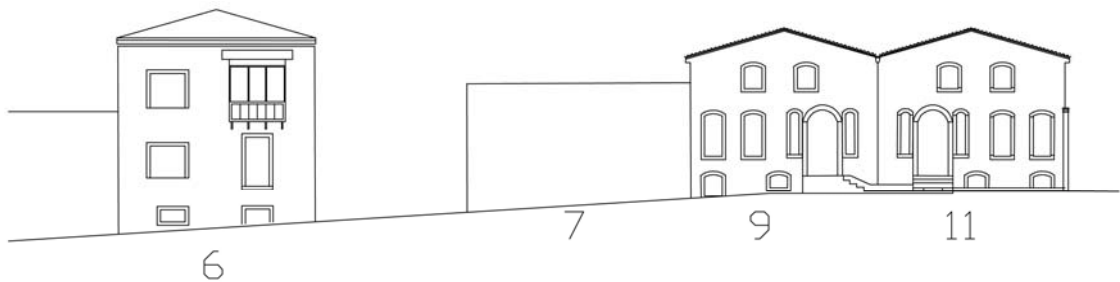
Silhouettes that should be conserved at 404 Street
